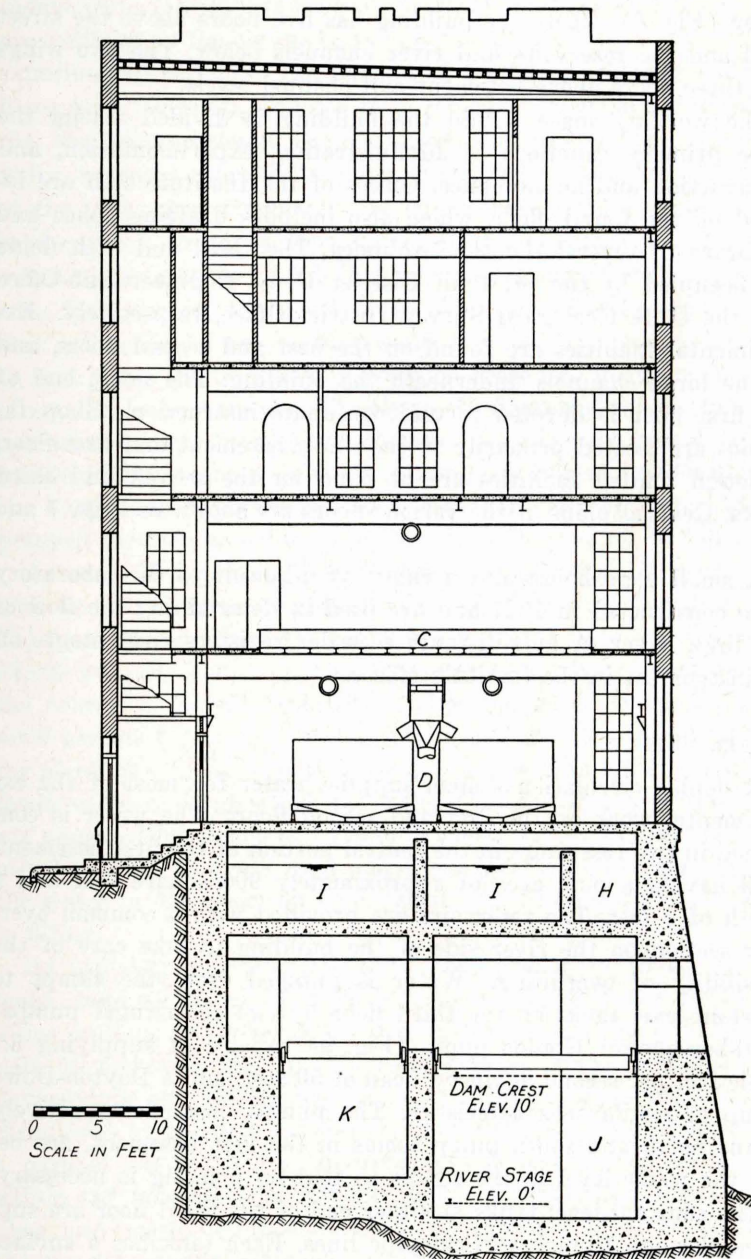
VERTICAL SECTION THROUGH CENTRAL TOWER OF LABORATORY.
